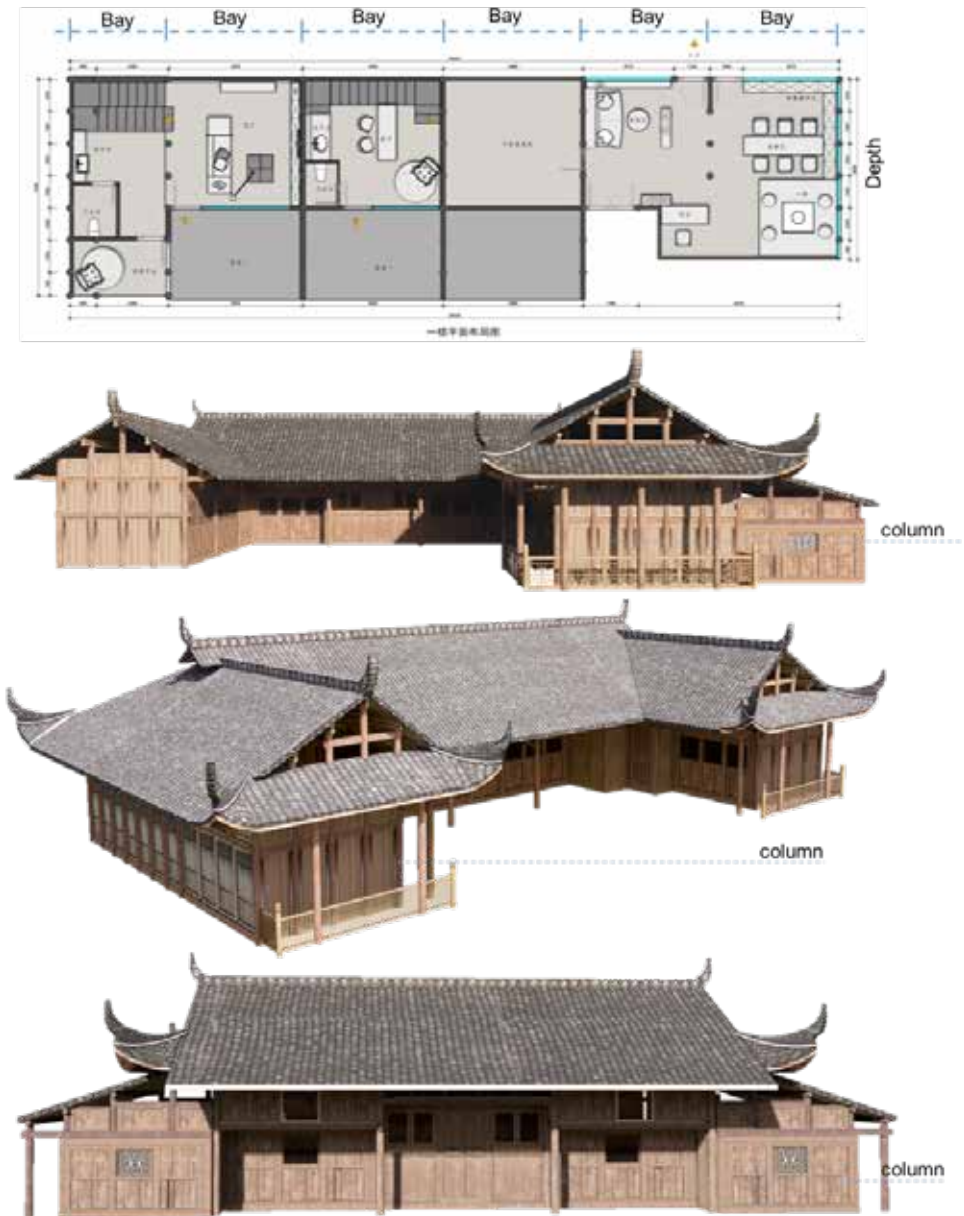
Building bays, depths, columns (source: drawing by author)
